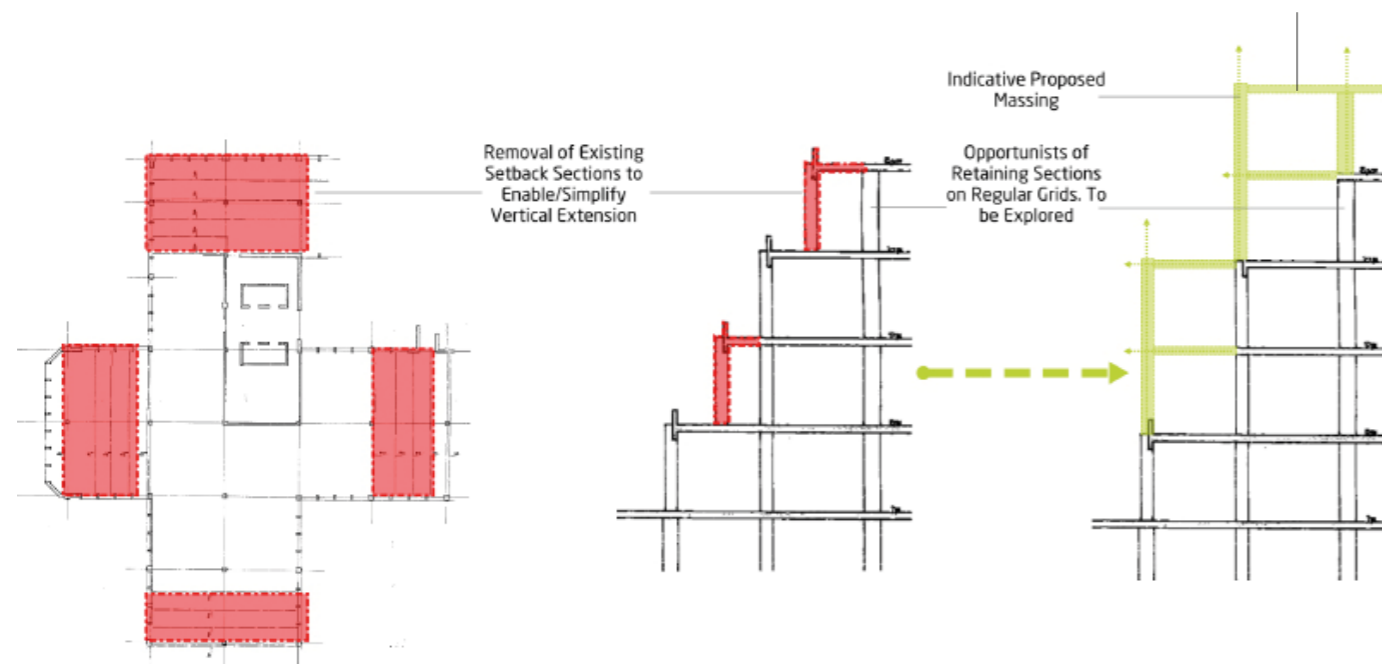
Plan and section views demonstrating demolition and extension principles
